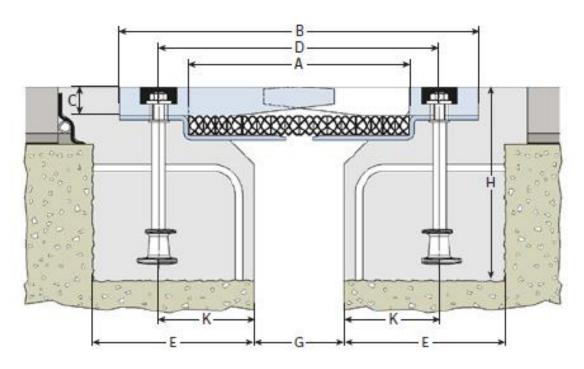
Typical cross section of WP joints type 3 from WP3200 to WP3 600
